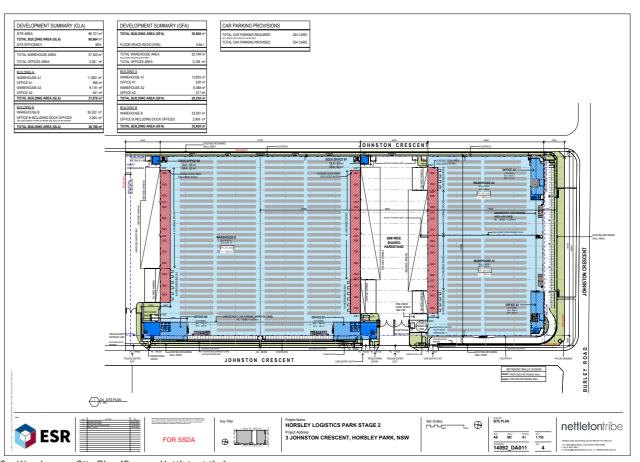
Warehouse - Site Plan (Source: Nettletontribe)
